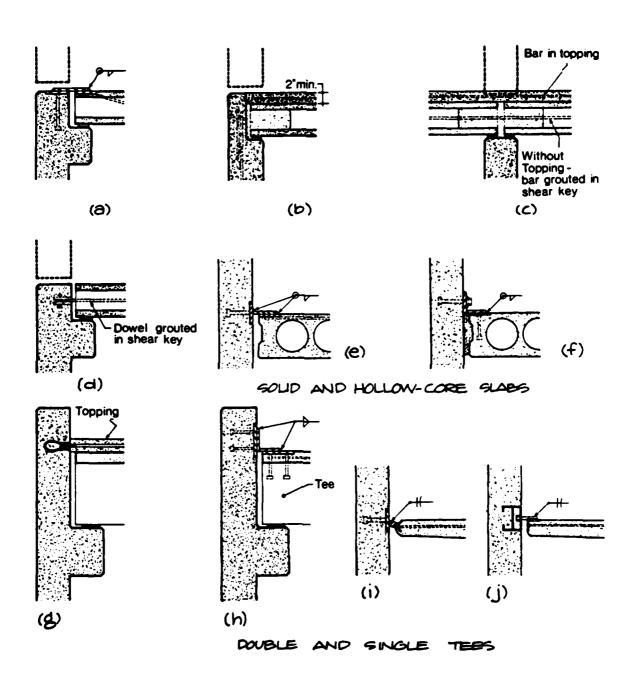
Wall to Floor or Roof Connections (Ref. 19).
